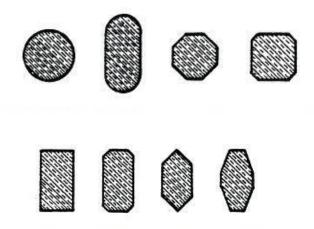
Typical cross-section shapes of piers for overcrossings or viaducts on land
